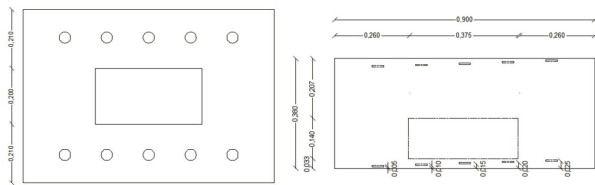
Front view and the horizontal section of the concrete structure under test (all the dimensions are in m).
